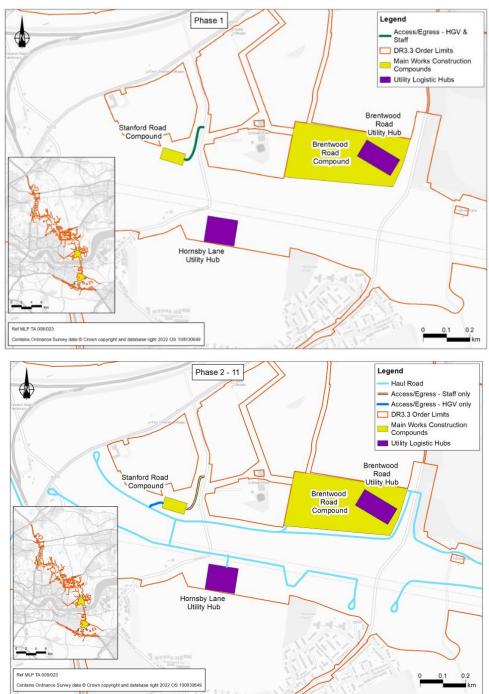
Brentwood Road Compound, Hornsby Lane Utility Hub and Brentwood Road Utility Hub access and egress arrangements
